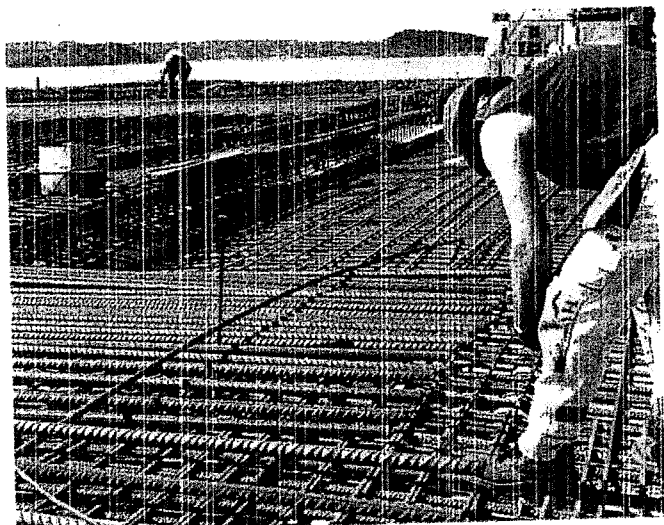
Within the deck of a concrete harbor structure, there is a lot of steel that needs proper protection⁷
